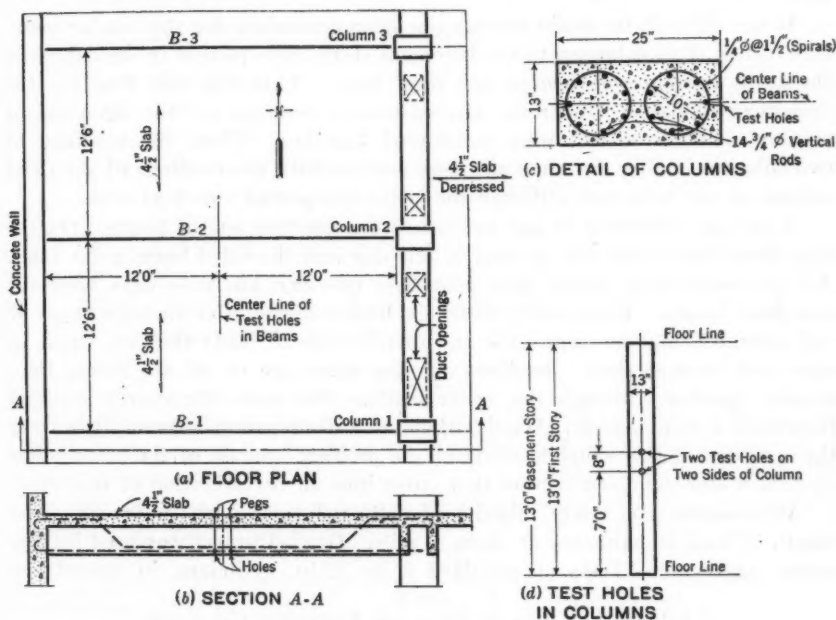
TYPICAL DETAILS OF BUILDING TESTED.
